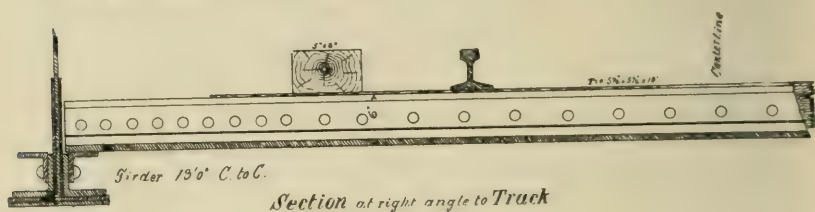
63D STREET CROSSING OF STREET RY., ILLINOIS CENTRAL R. R. AND SOUTH SIDE ELEVATED R. R.
